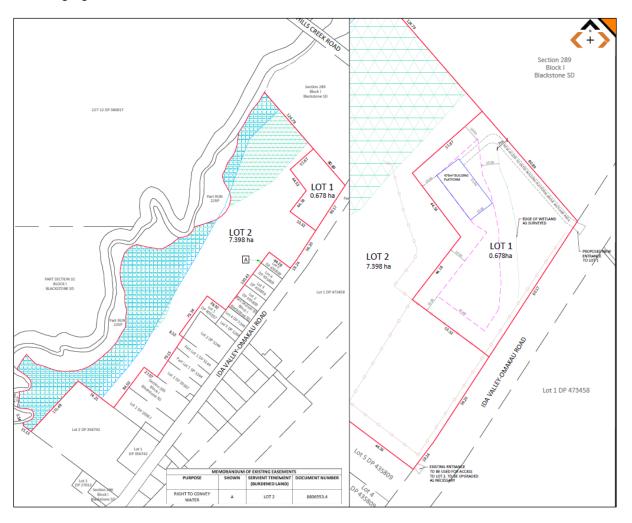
Extract of proposed scheme plan (Source: SurveyWorx).
